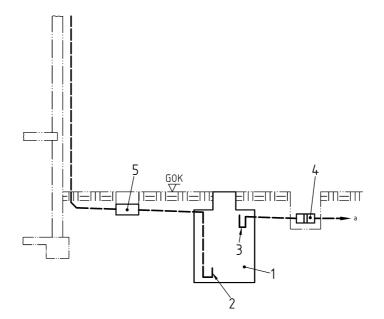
Example of a ground reservoir with a connection to a mixed-water sewer with an elevating system
